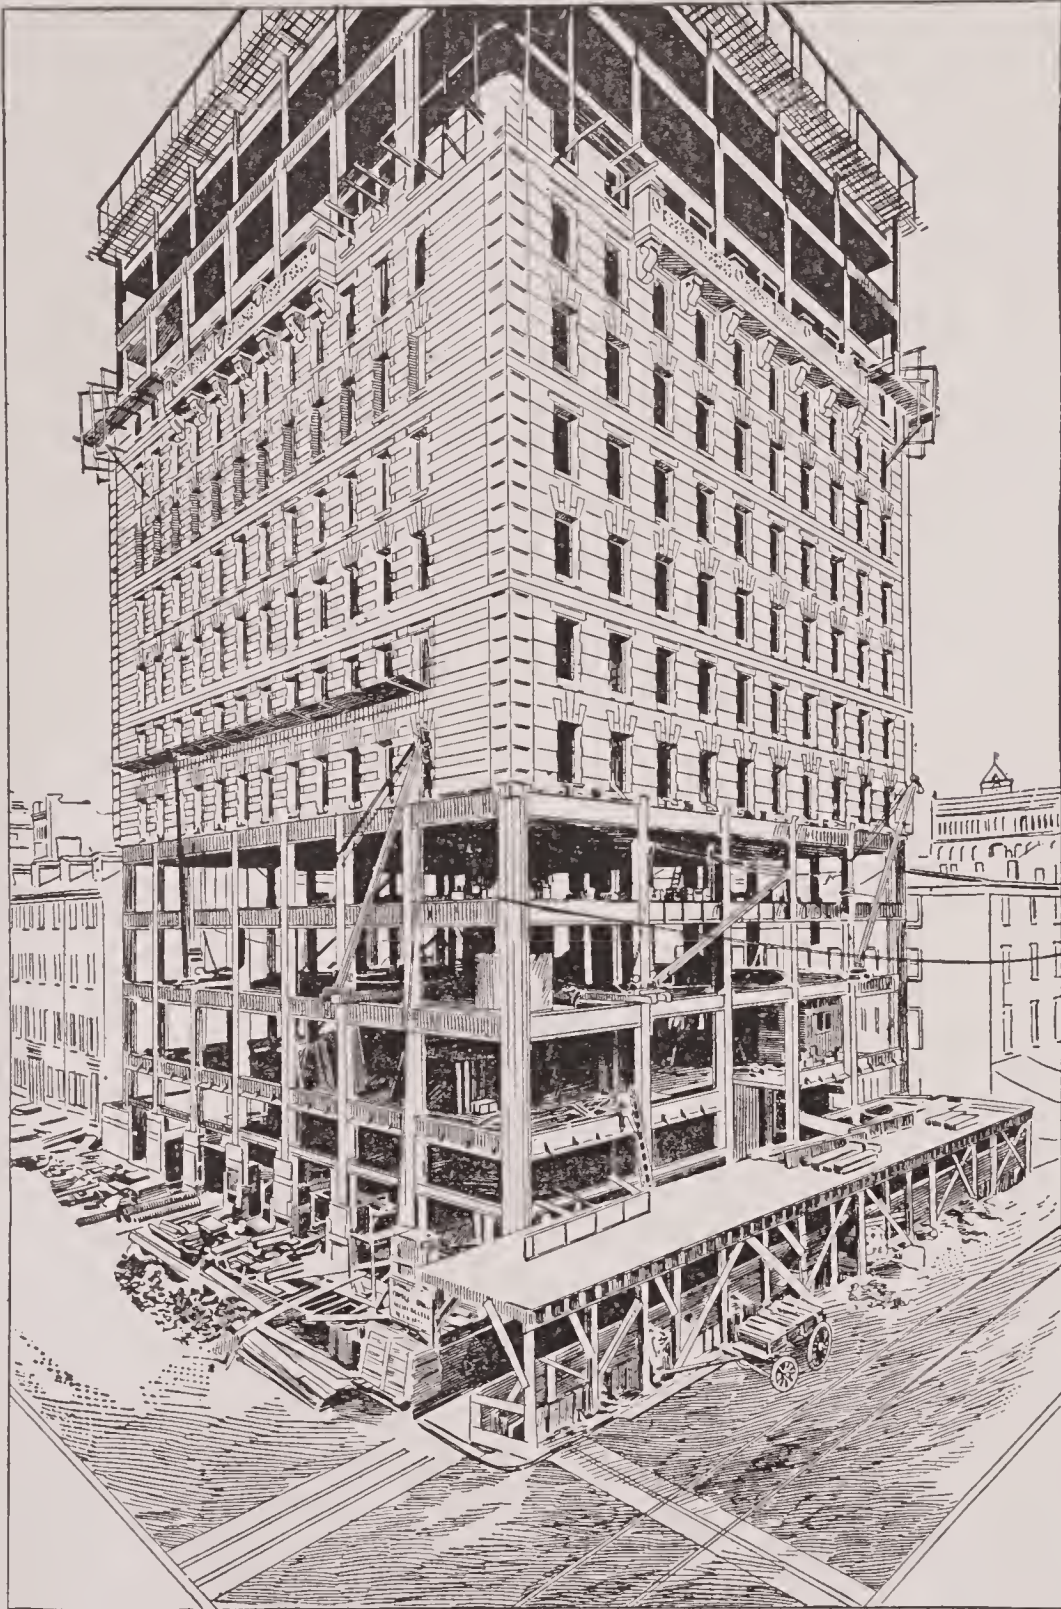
MODERN SKELETON BUILDING UNDER CONSTRUCTION.
